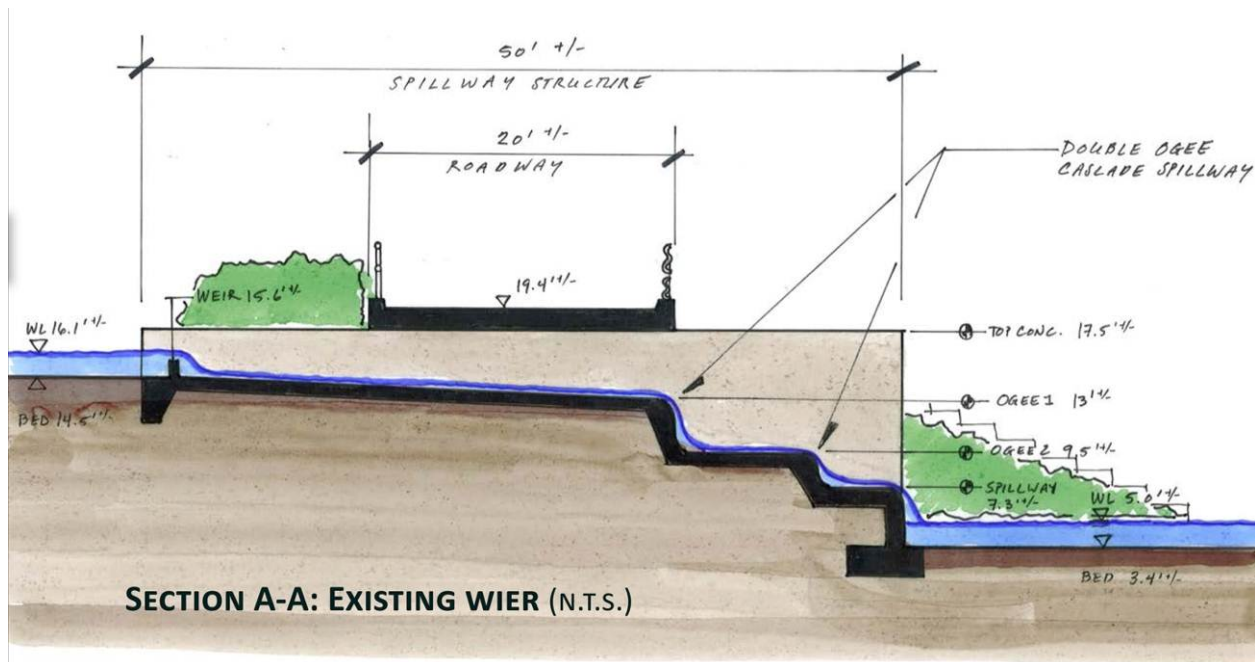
Approximate Cross-Section of Forge Road Dam spillway structure.
